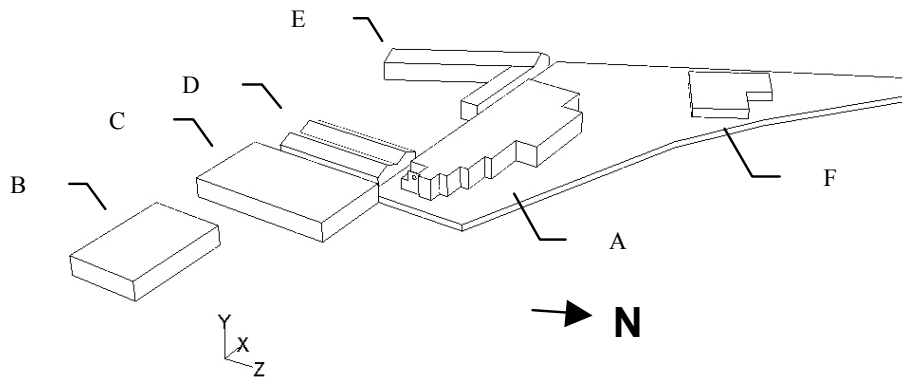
Perspective view of the site with the industrial building (A) and the surrounding buildings (B-F)
